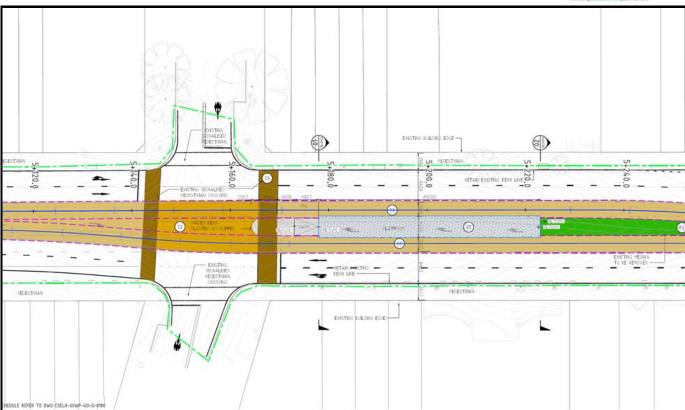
Anzac Parade / Strachan Street – Proposed Conditions
